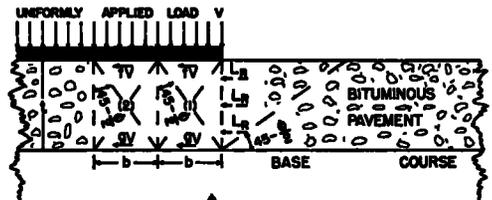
Diagram illustrating that Friction between Tire and Pavement and between Pavement and Base is equivalent to additional Lateral Support for the Section of Pavement under a Loaded Area
